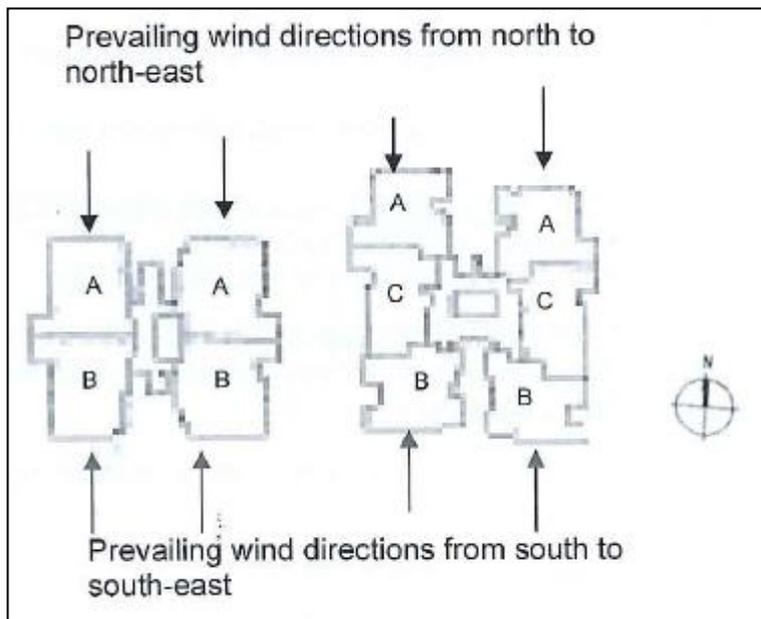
Building layout design that facilitate cross ventilation
